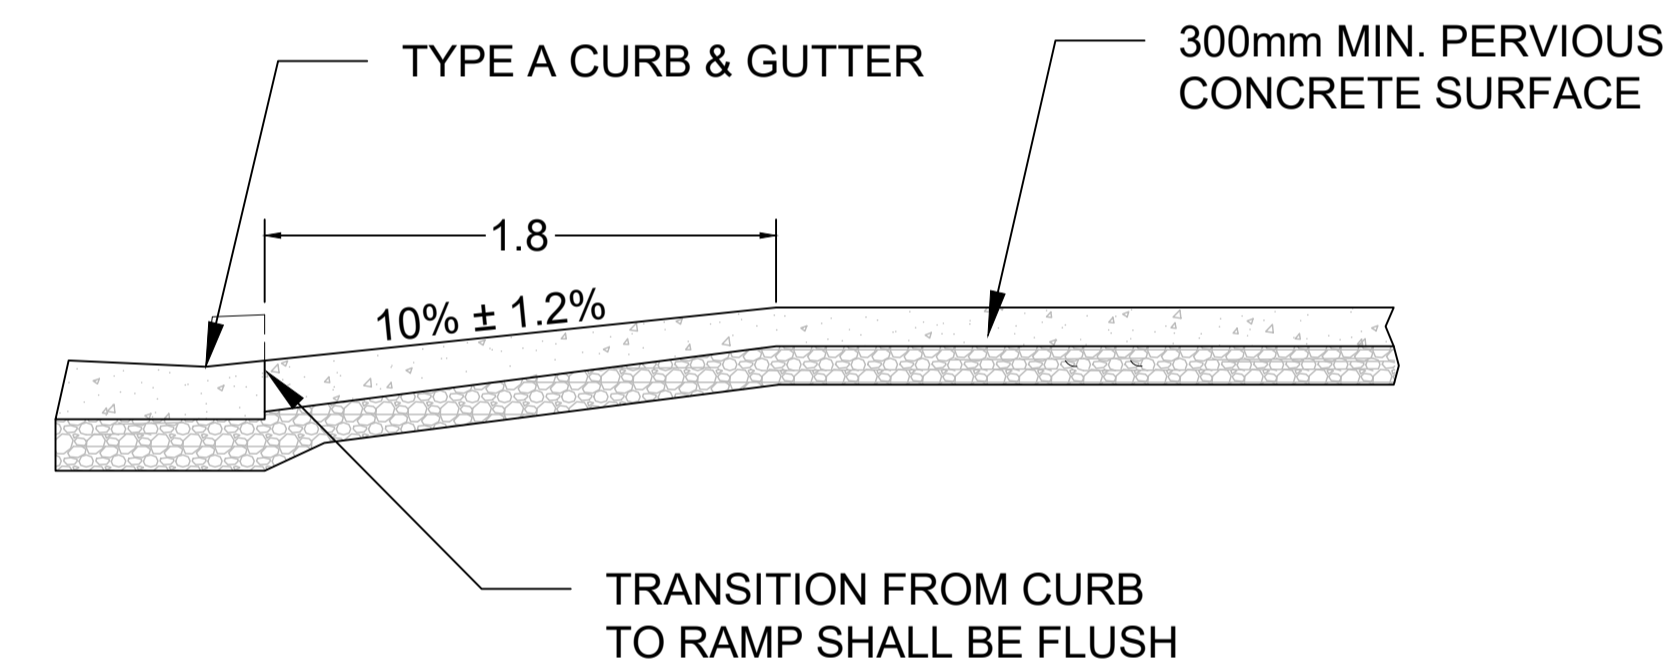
DETAIL C: EMERGENCY ACCESS DRIVEWAY CROSSING
